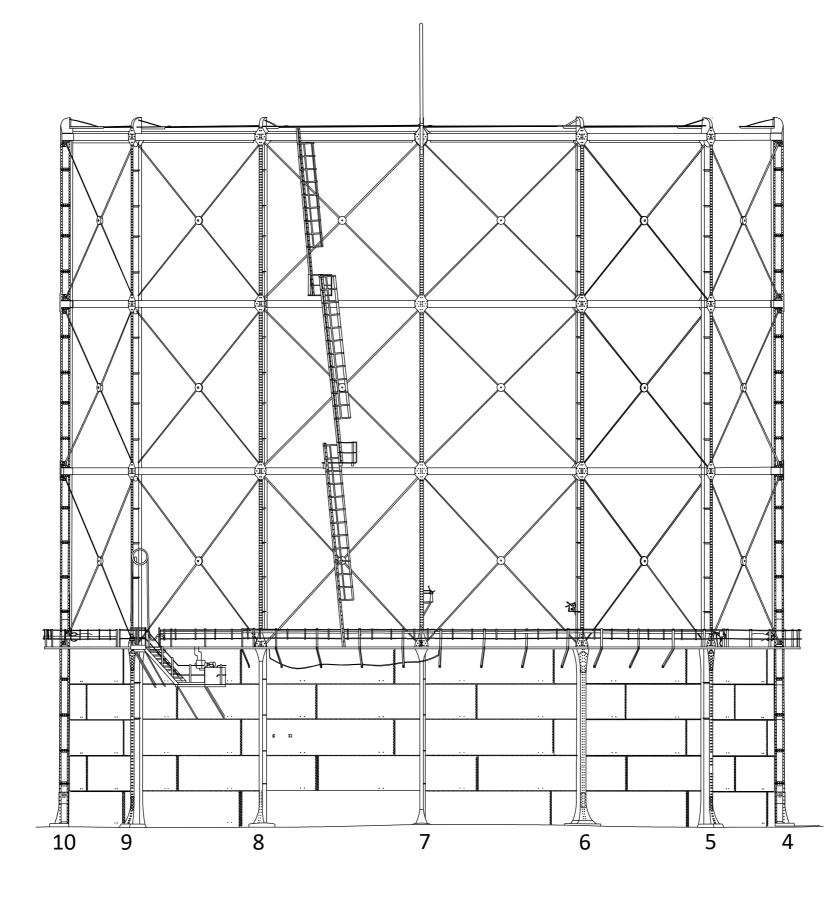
Gasholder No 2, Yarnton Way, Belvedere, south-facing elevation
